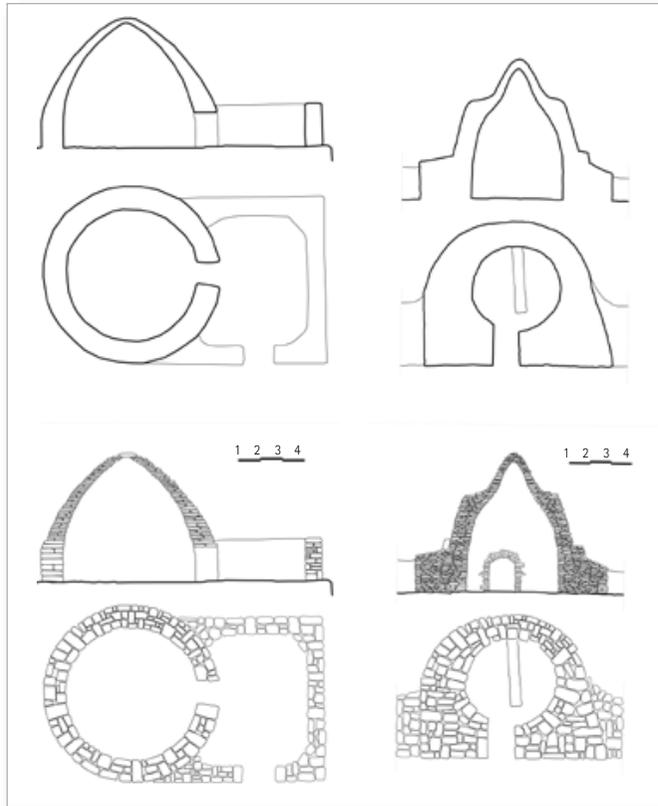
Layout and section of a *chozo* corbelled dome structure, closing to a yard (Extremadura, Spain)
